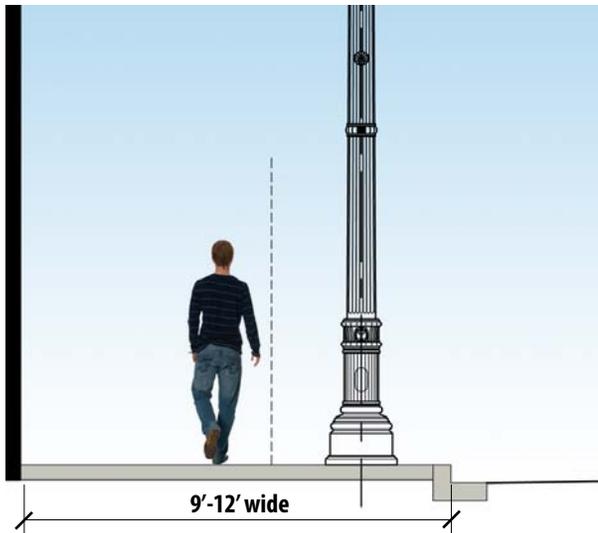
Shy zones in sidewalks 9' - 12' wide
